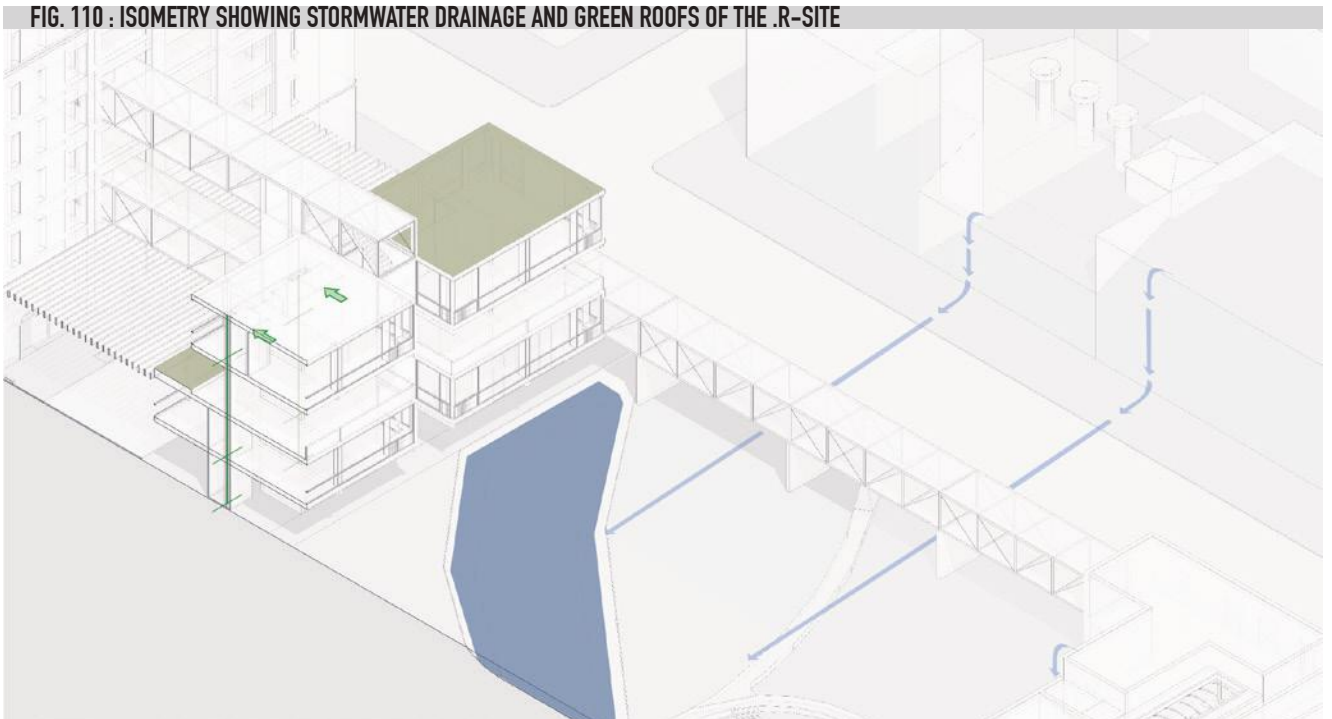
ISOMETRY SHOWING STORMWATER DRAINAGE AND GREEN ROOFS OF THE .R-SITE
